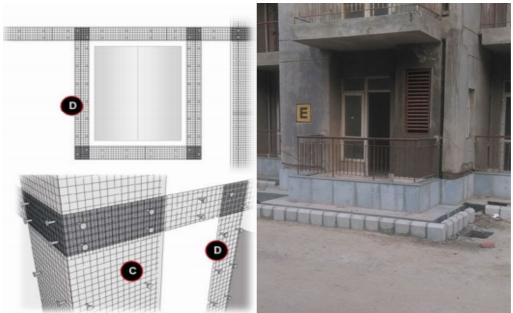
wire mesh installation for plinth protection (left) Stone plinth protection installation (right) (Credit: www.bptp.com)
